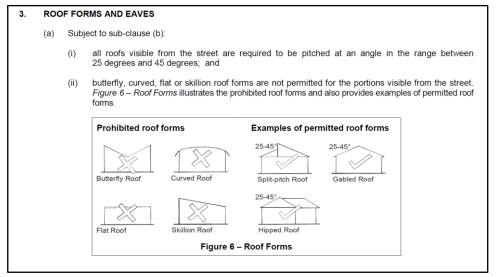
Permitted and Prohibited Roof Forms within Arlington
